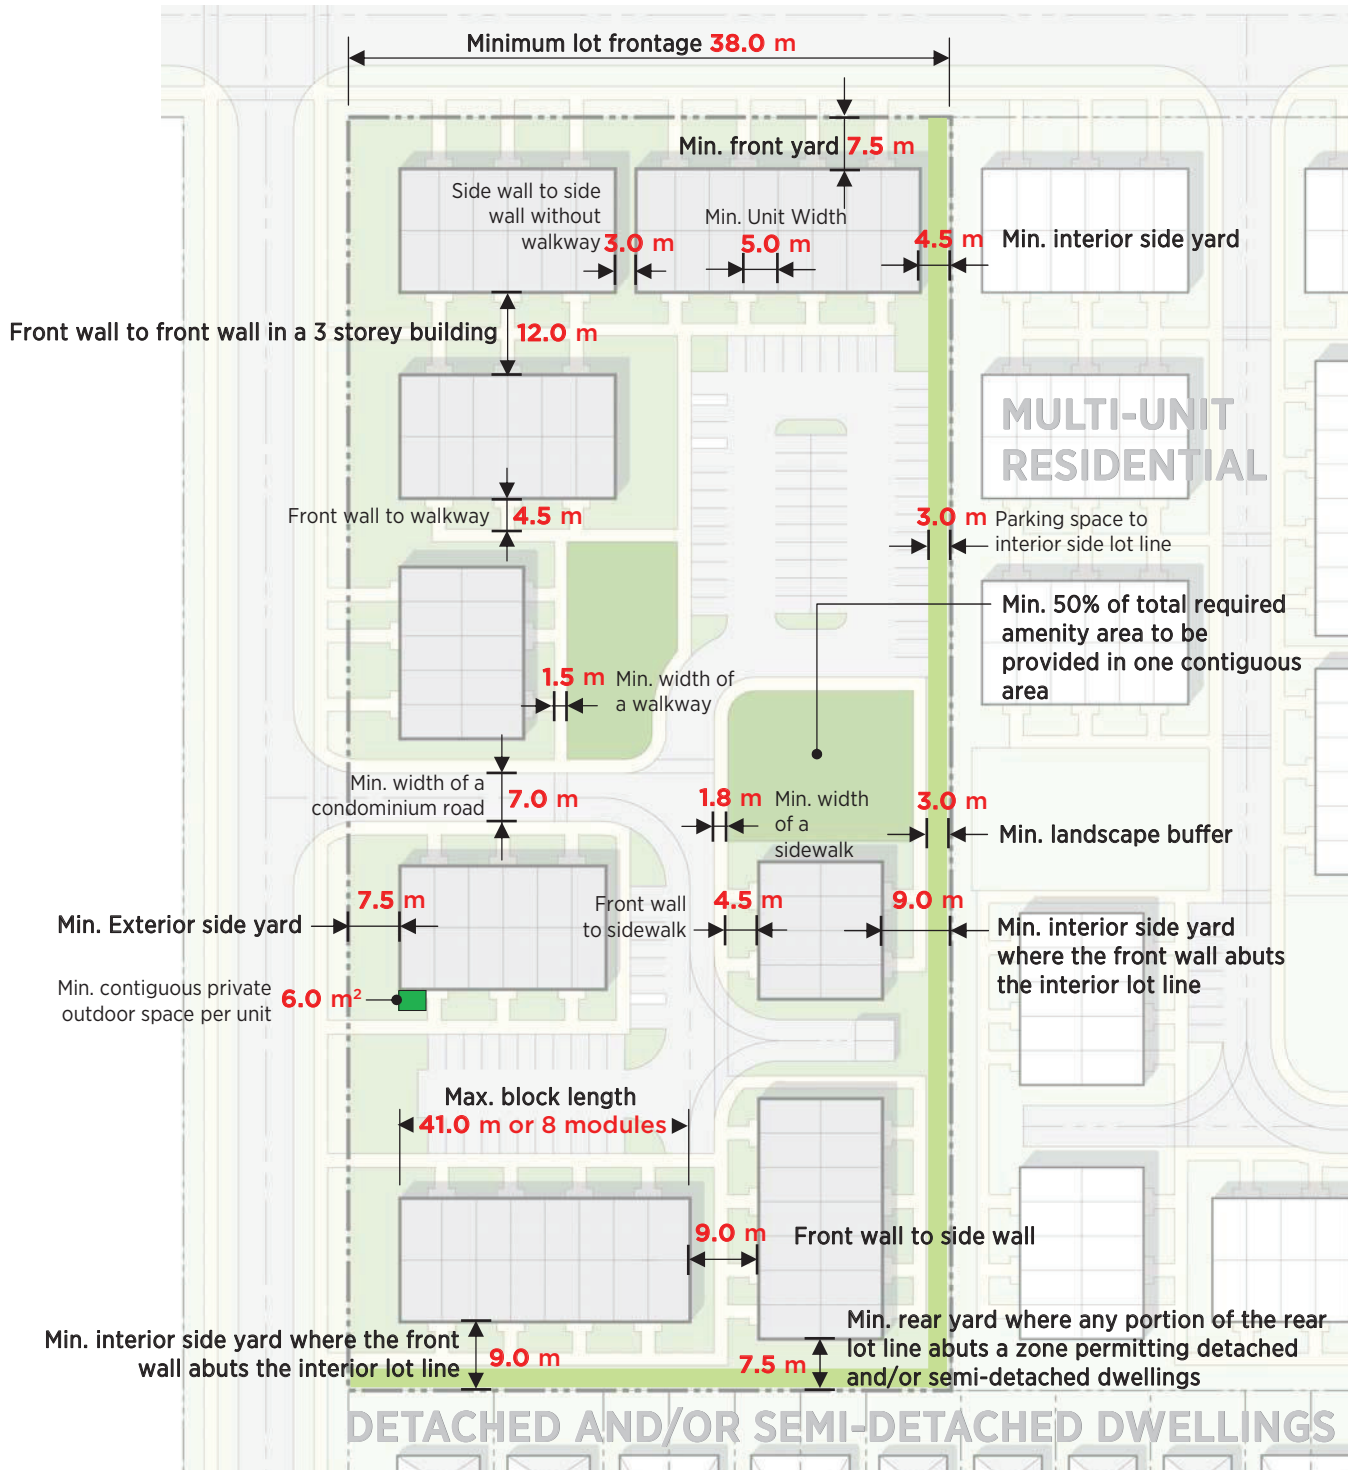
Standard Dimensions for Back to Back Townhouses (RM11). For Additional Standards refer to the Zoning By-Law. The above drawing is for illustration purpose only and not to scale.
